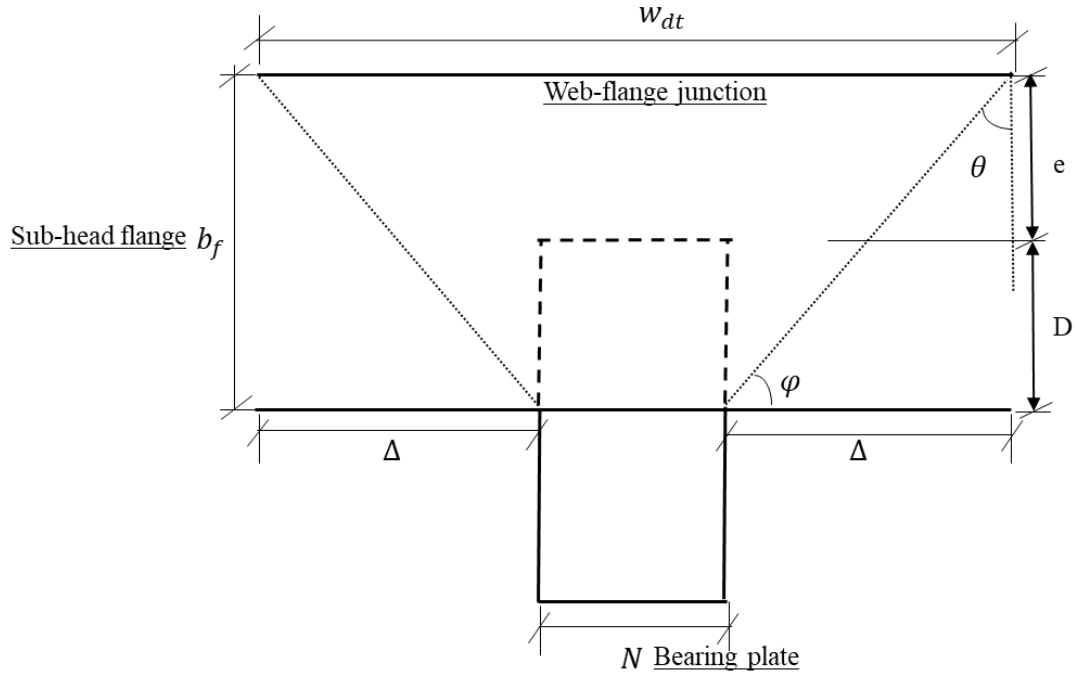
Failure pattern for the sub-head's flange.
